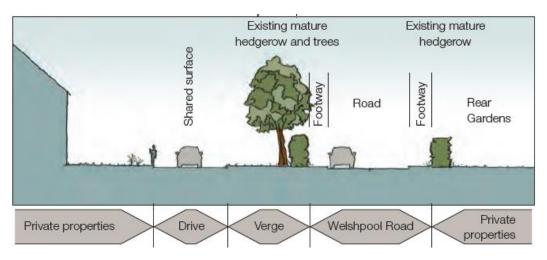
Typical proposed cross section on Welshpool Road (Source: SUE West Masterplan)
